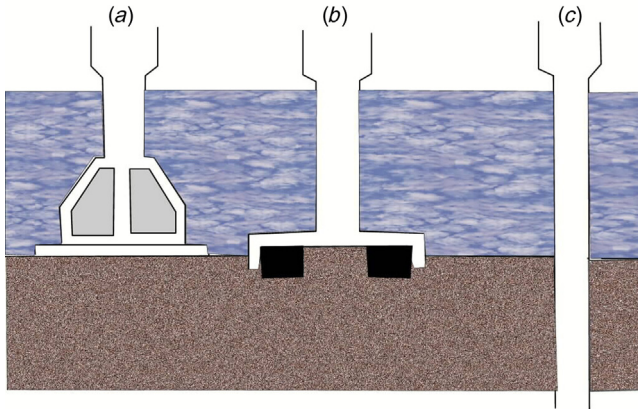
Some foundation types for offshore wind turbine towers placed in shallow waters; (a) sand-filled caisson standing on the bottom, (b) suction buckets, (c) steel monopile. These foundation types are in use at locations with clay-till water floor material.
